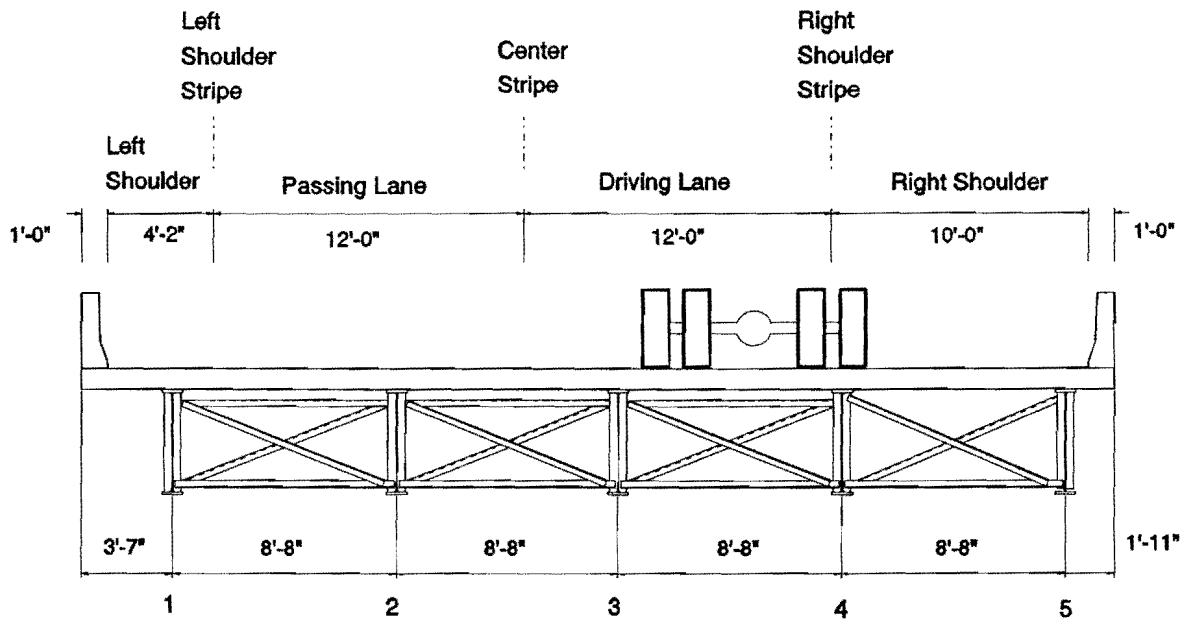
Location for test truck positioned with right wheel on right shoulder stripe.
